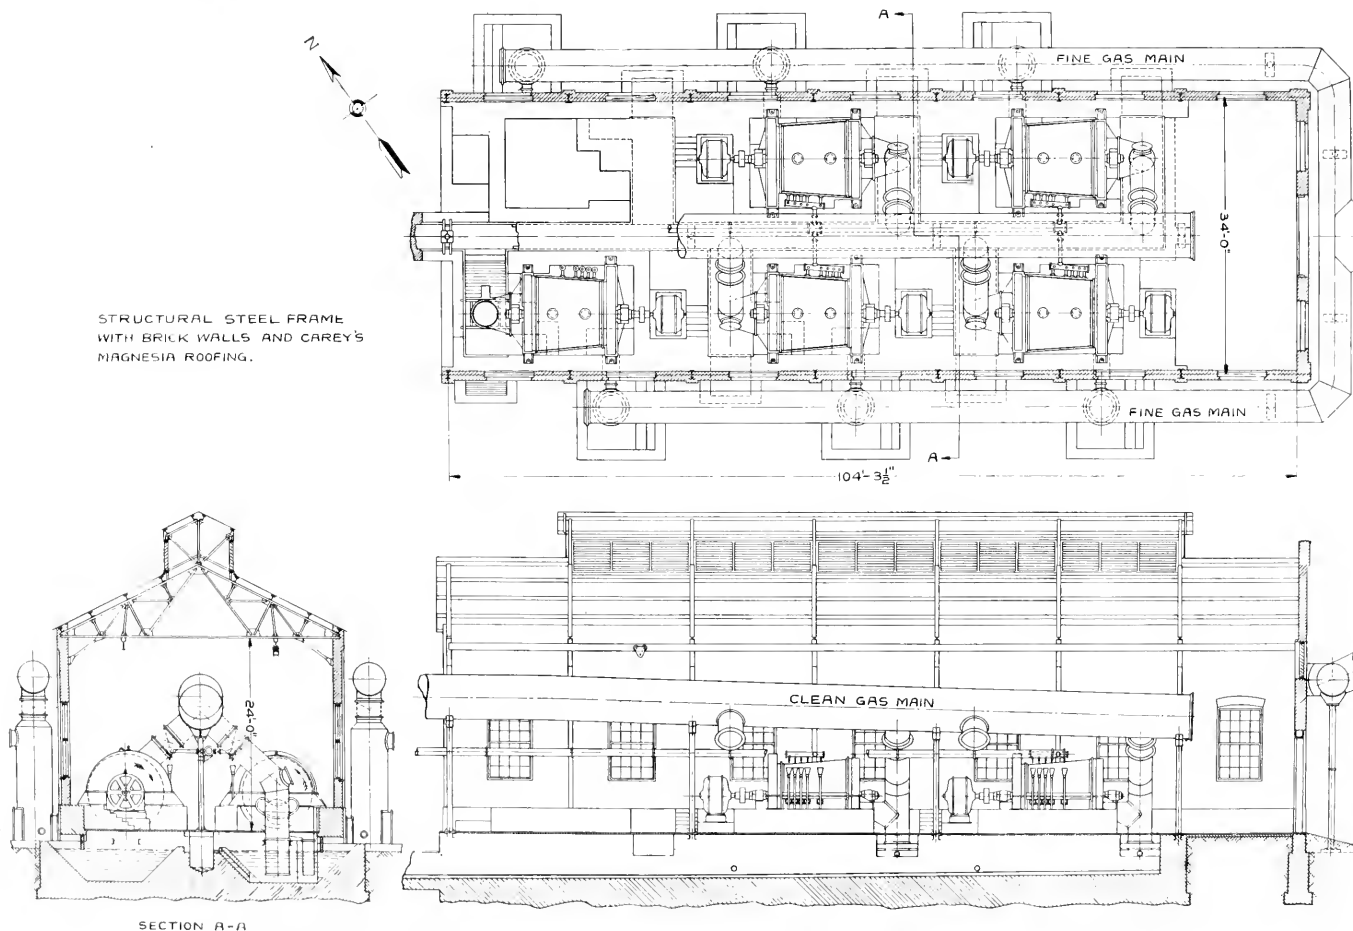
PLAN AND ELEVATION OF THEISEN WASHER INSTALLATION
